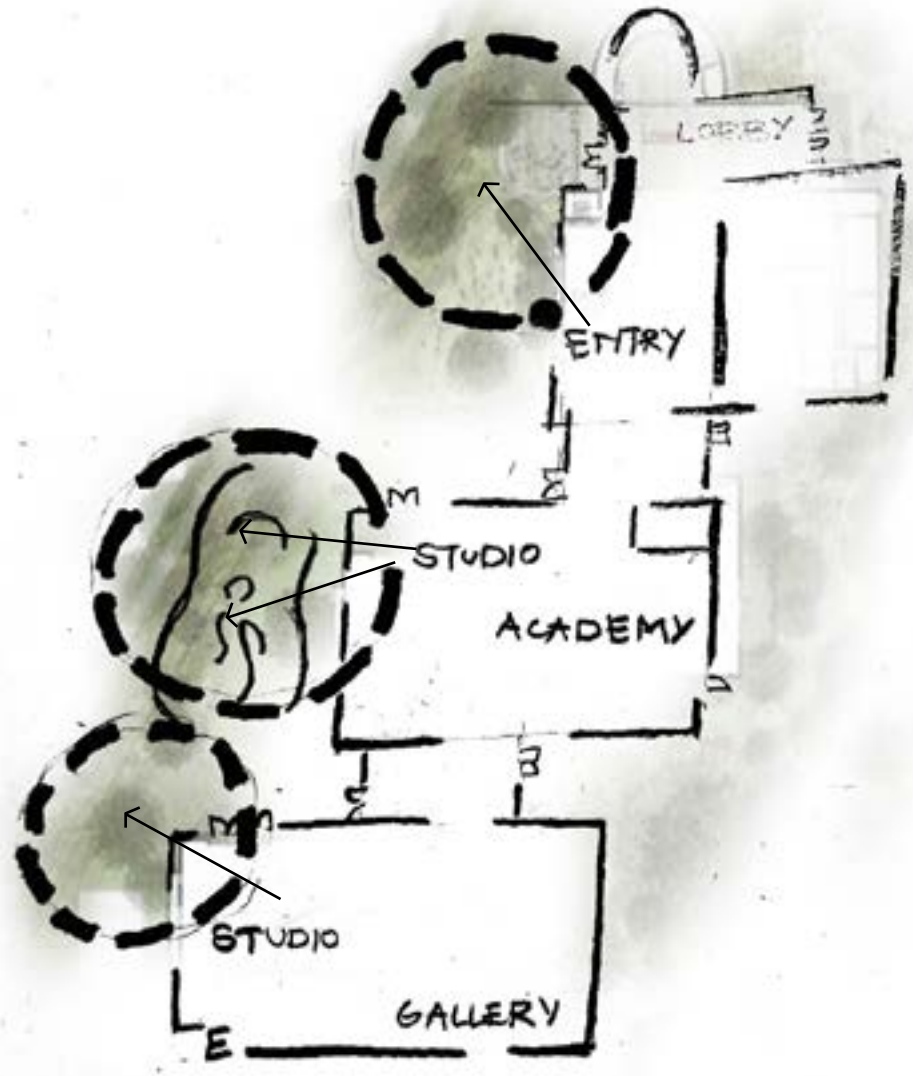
BI: Built plan and vegetation come together (Author, 2021)
